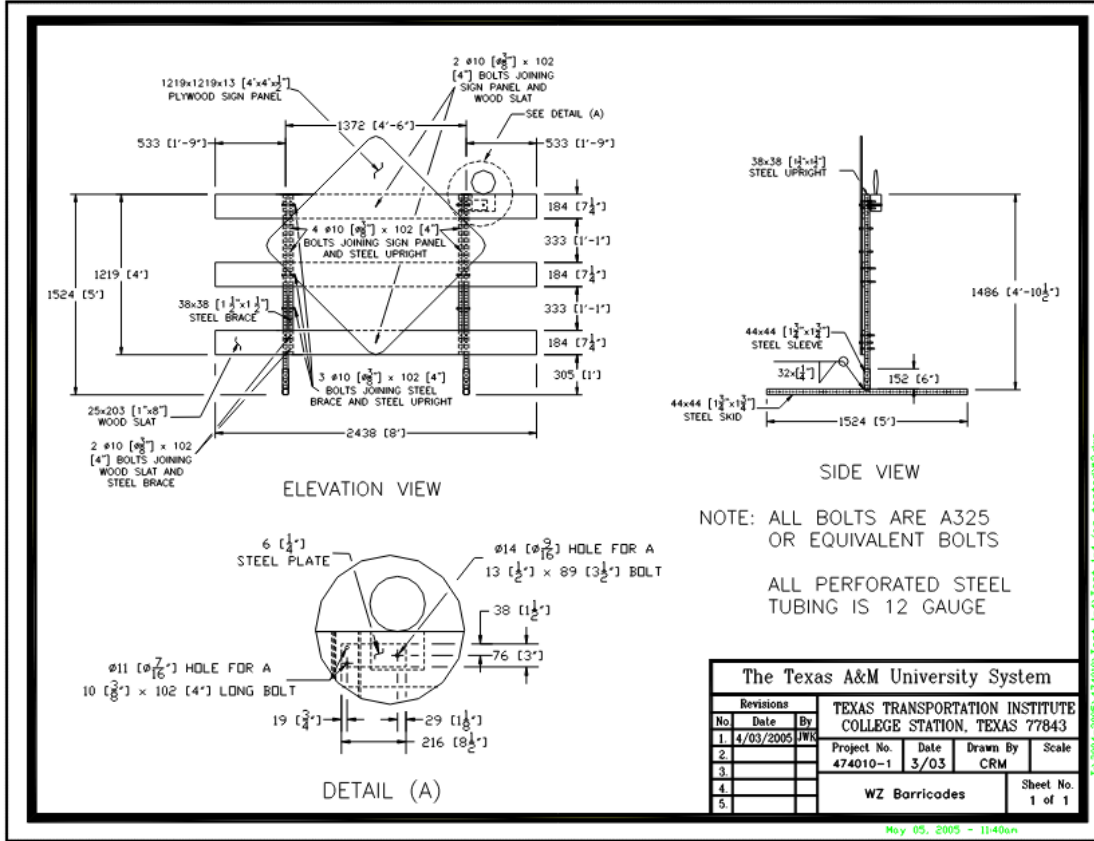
Details of Type III Barricade Evaluated in Test 1 (3)
